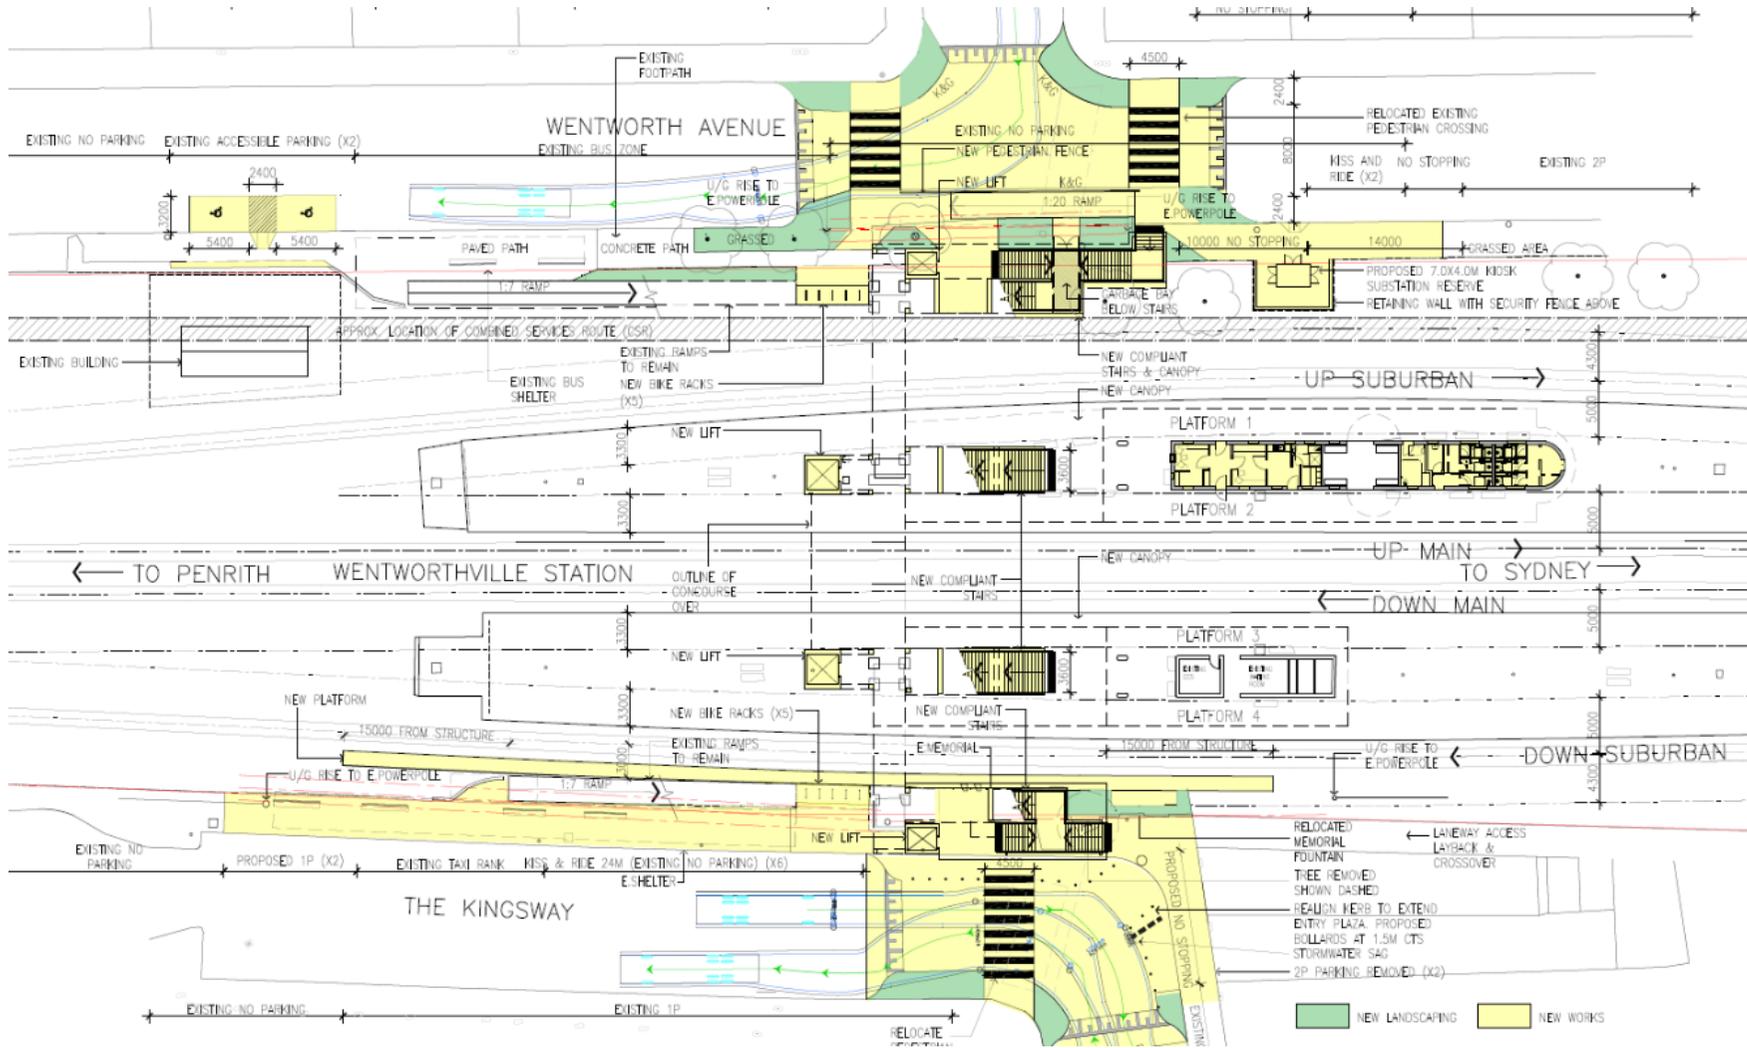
The plan of proposed station upgrading works, to platforms and to The Kingsway and Wentworth Avenue entries.
